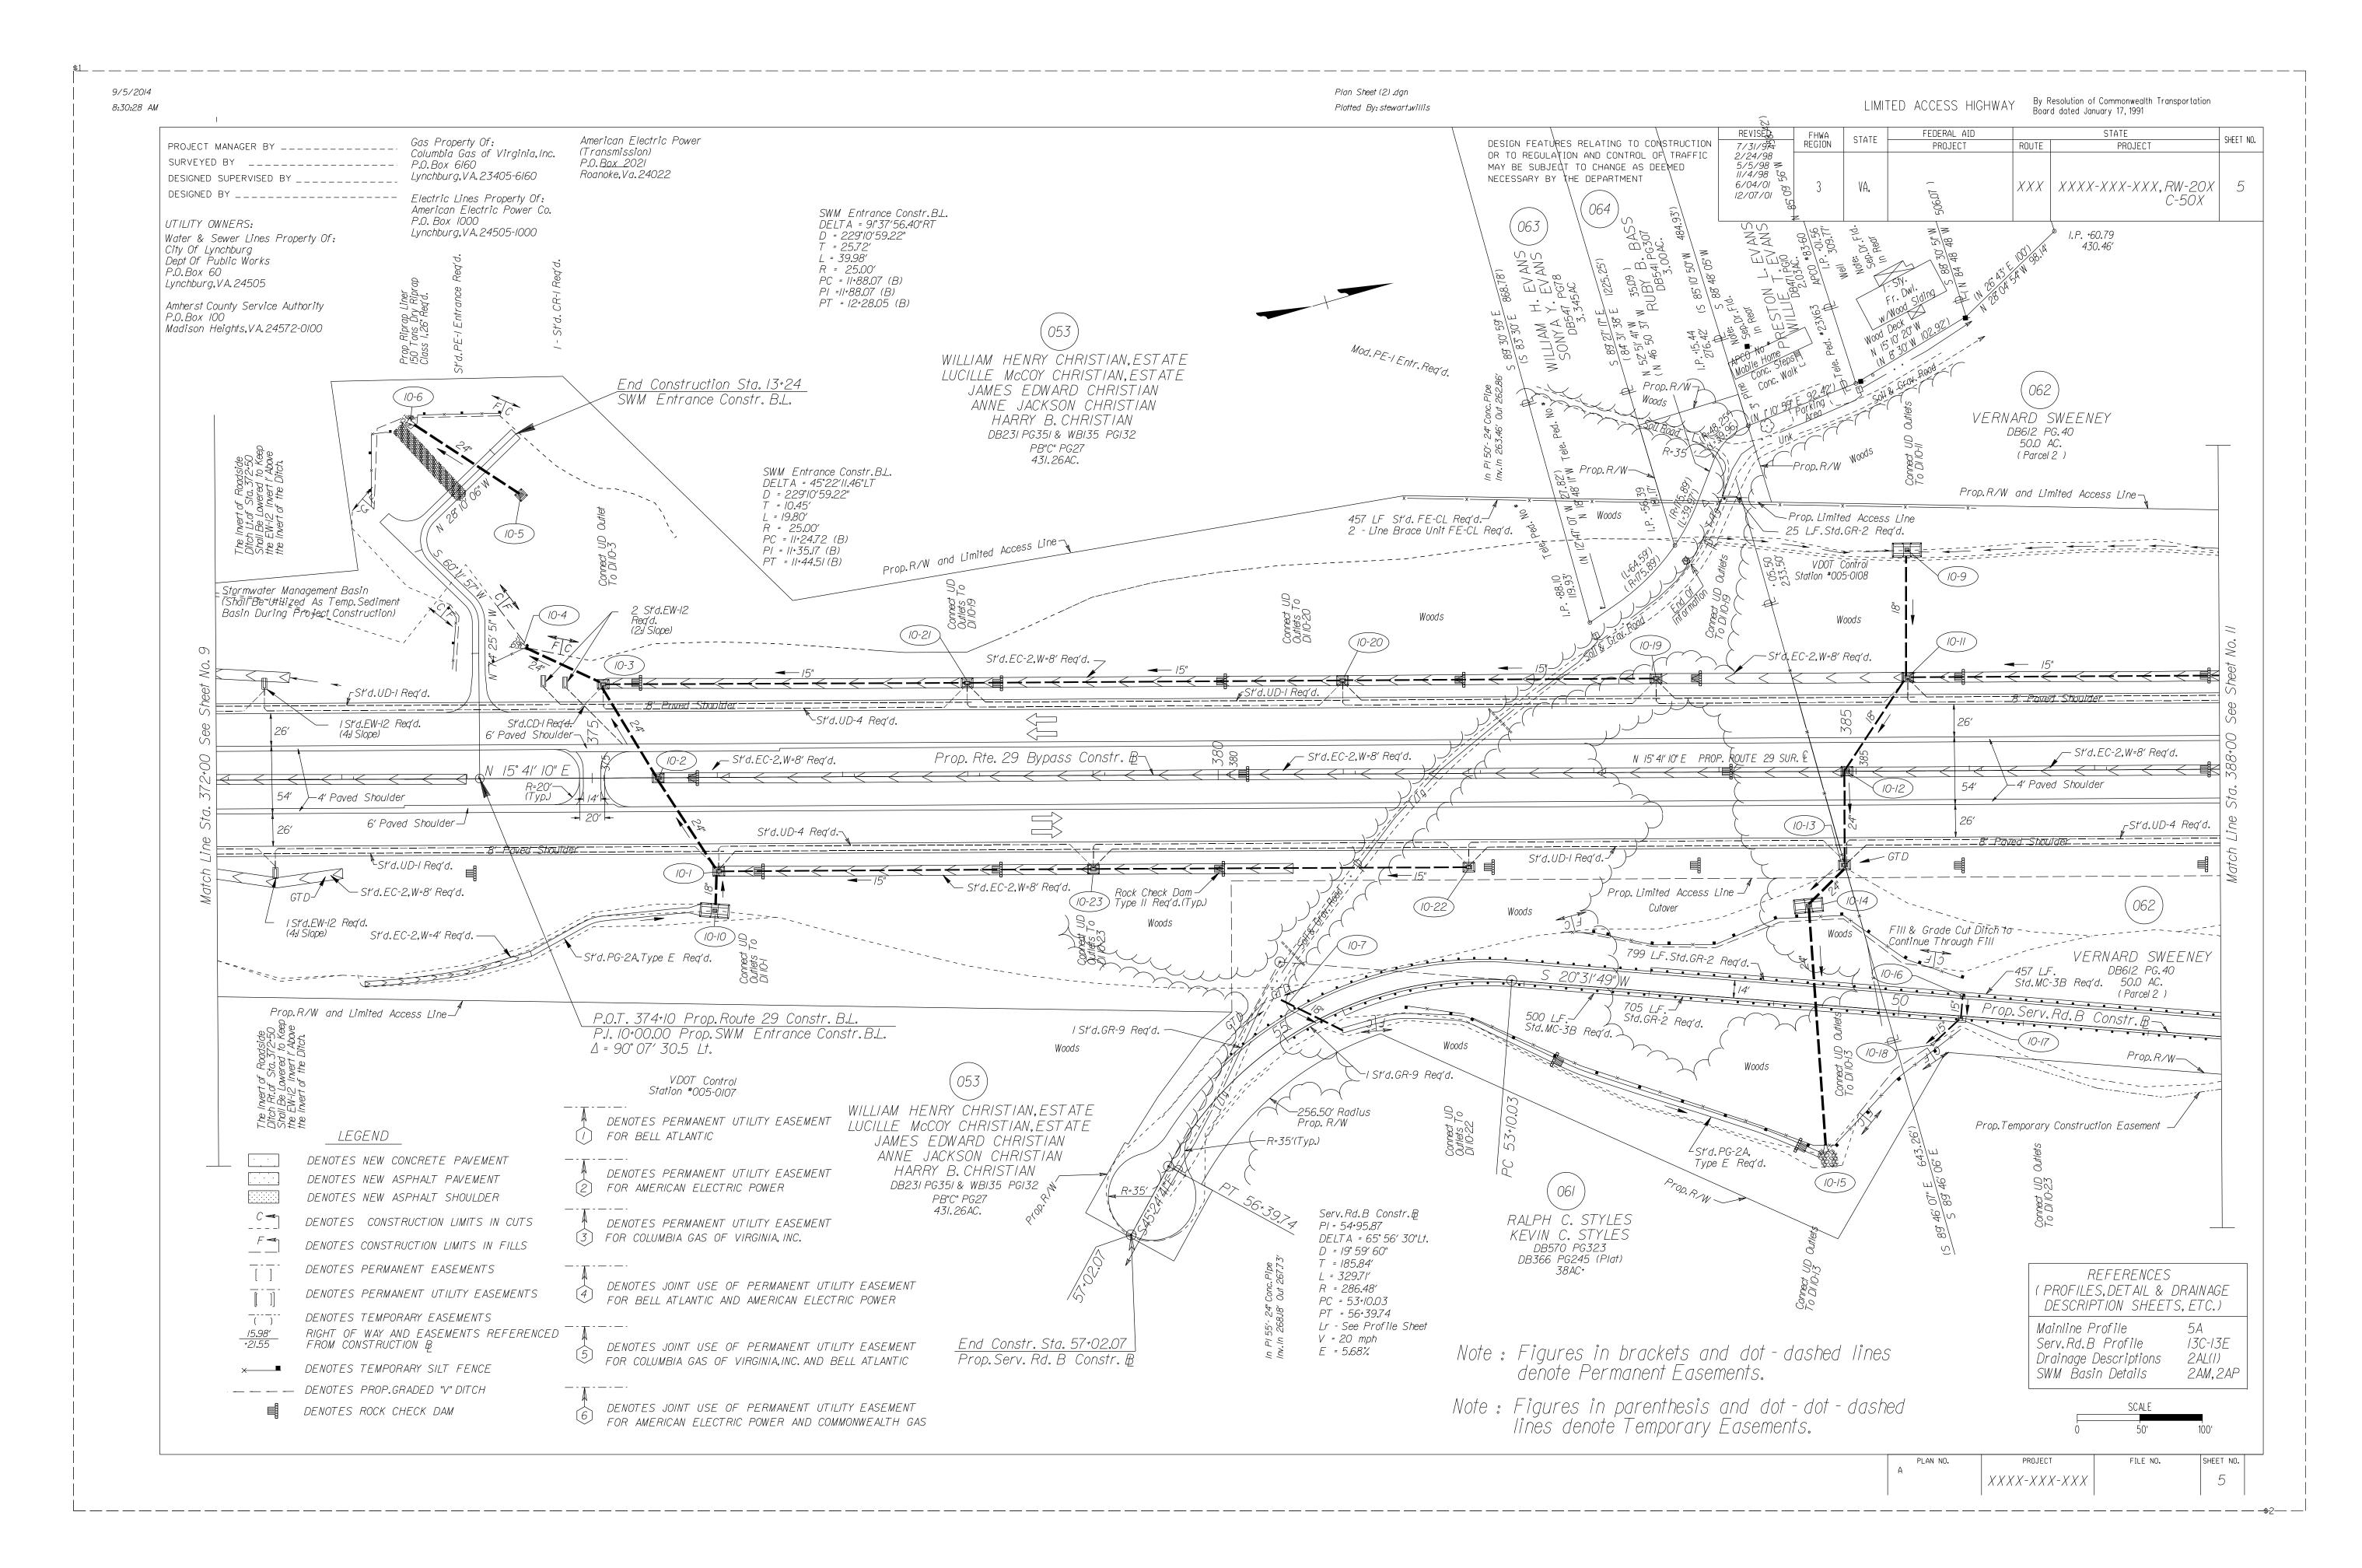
H - 32 SAMPLE 2 PLAN SHEET
